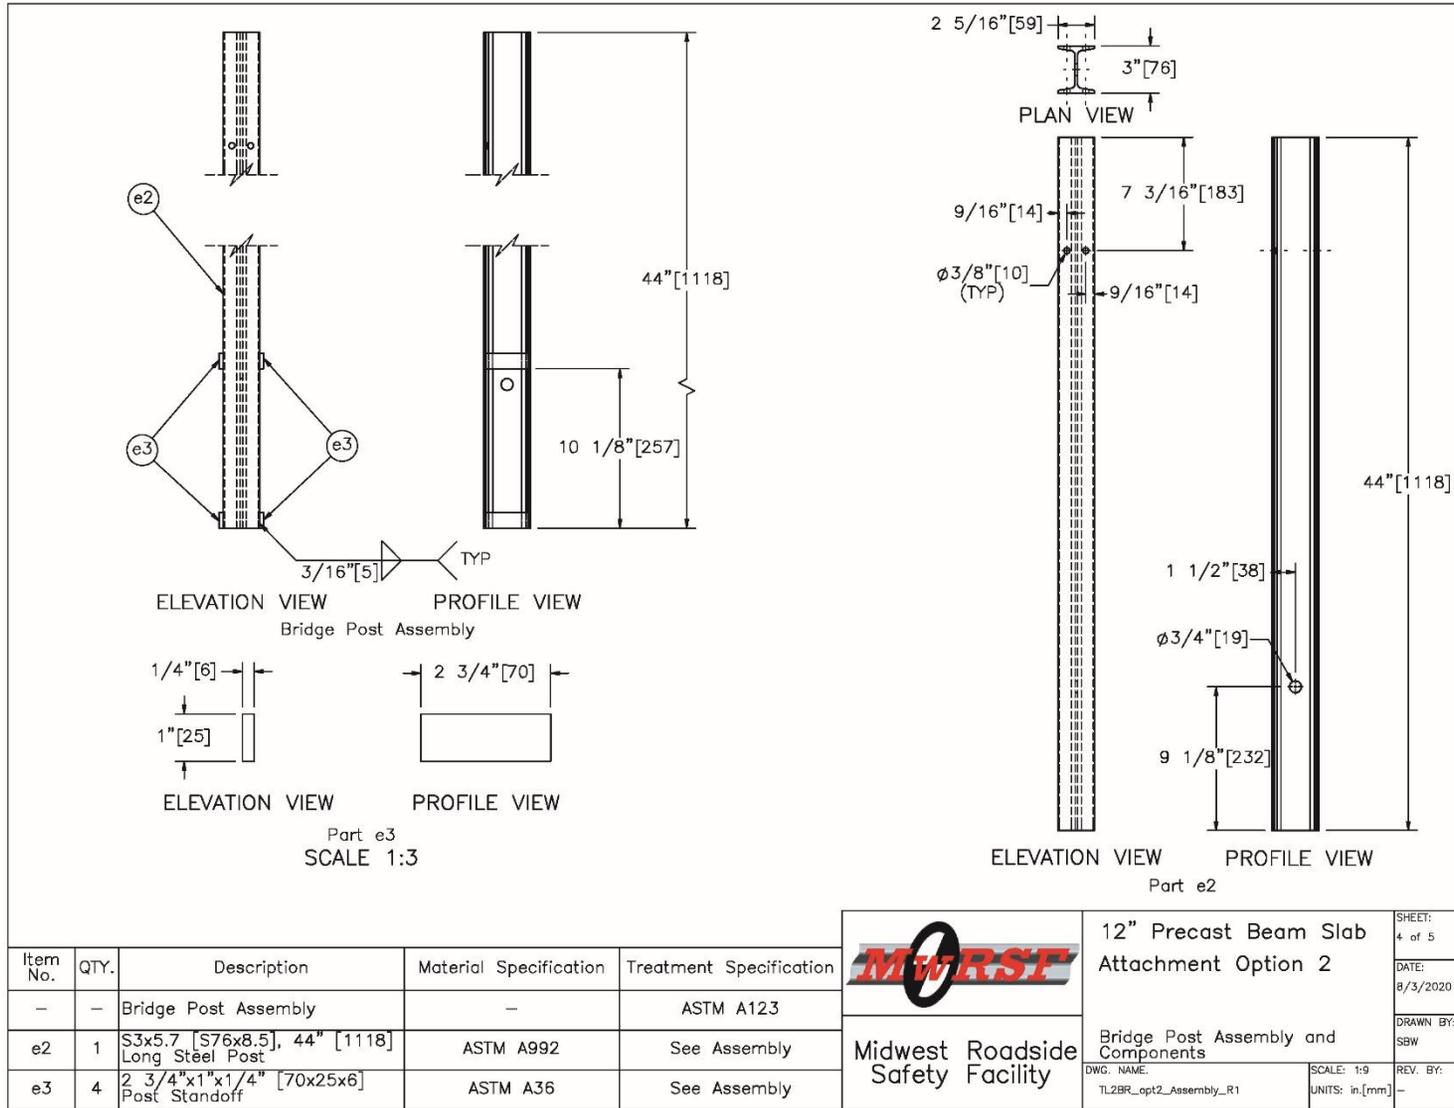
System Details, TL-2 Bridge Rail Attachment to 12-in. Deck, Option 2, Post Assembly
